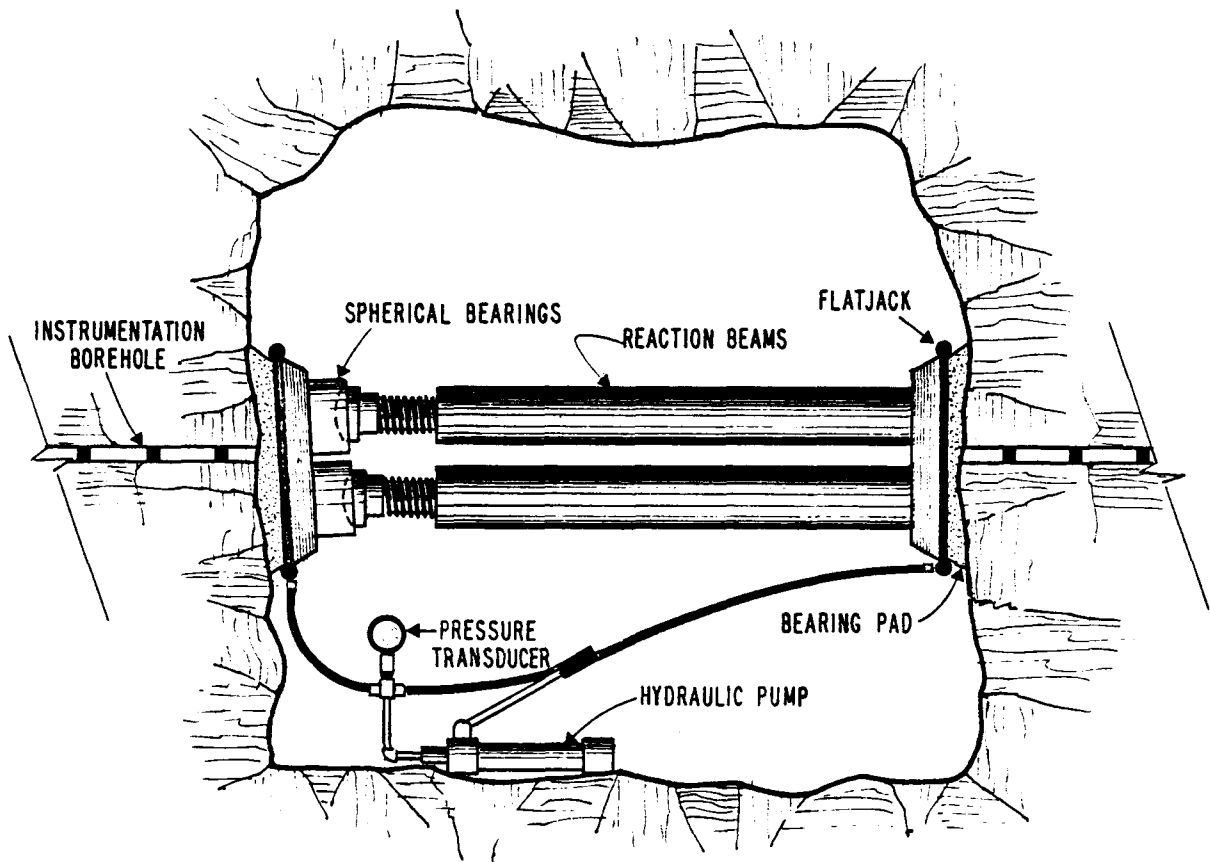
TYPICAL FLEXIBLE PLATE LOADING TEST SETUP SCHEMATIC
